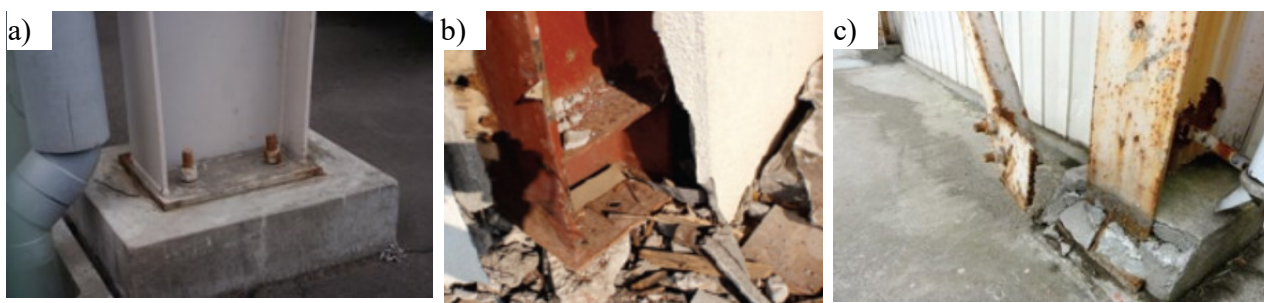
Damaged welded connections after Tohoku, 2011 [17] for a) elongation of anchor bolts; b) fracture of anchor bolts; c) spalling of concrete.
